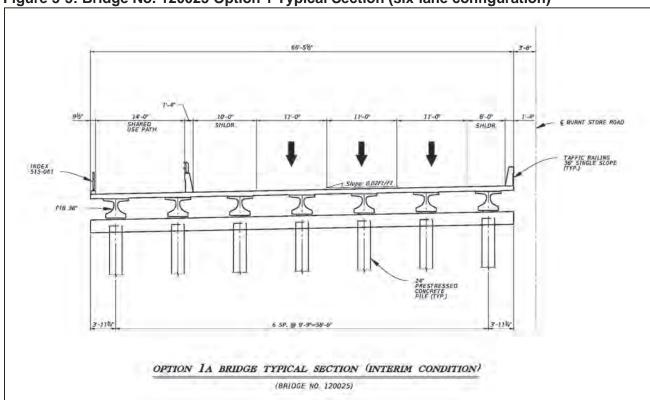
Bridge No. 120025 Option 1 Typical Section (six-lane configuration)
